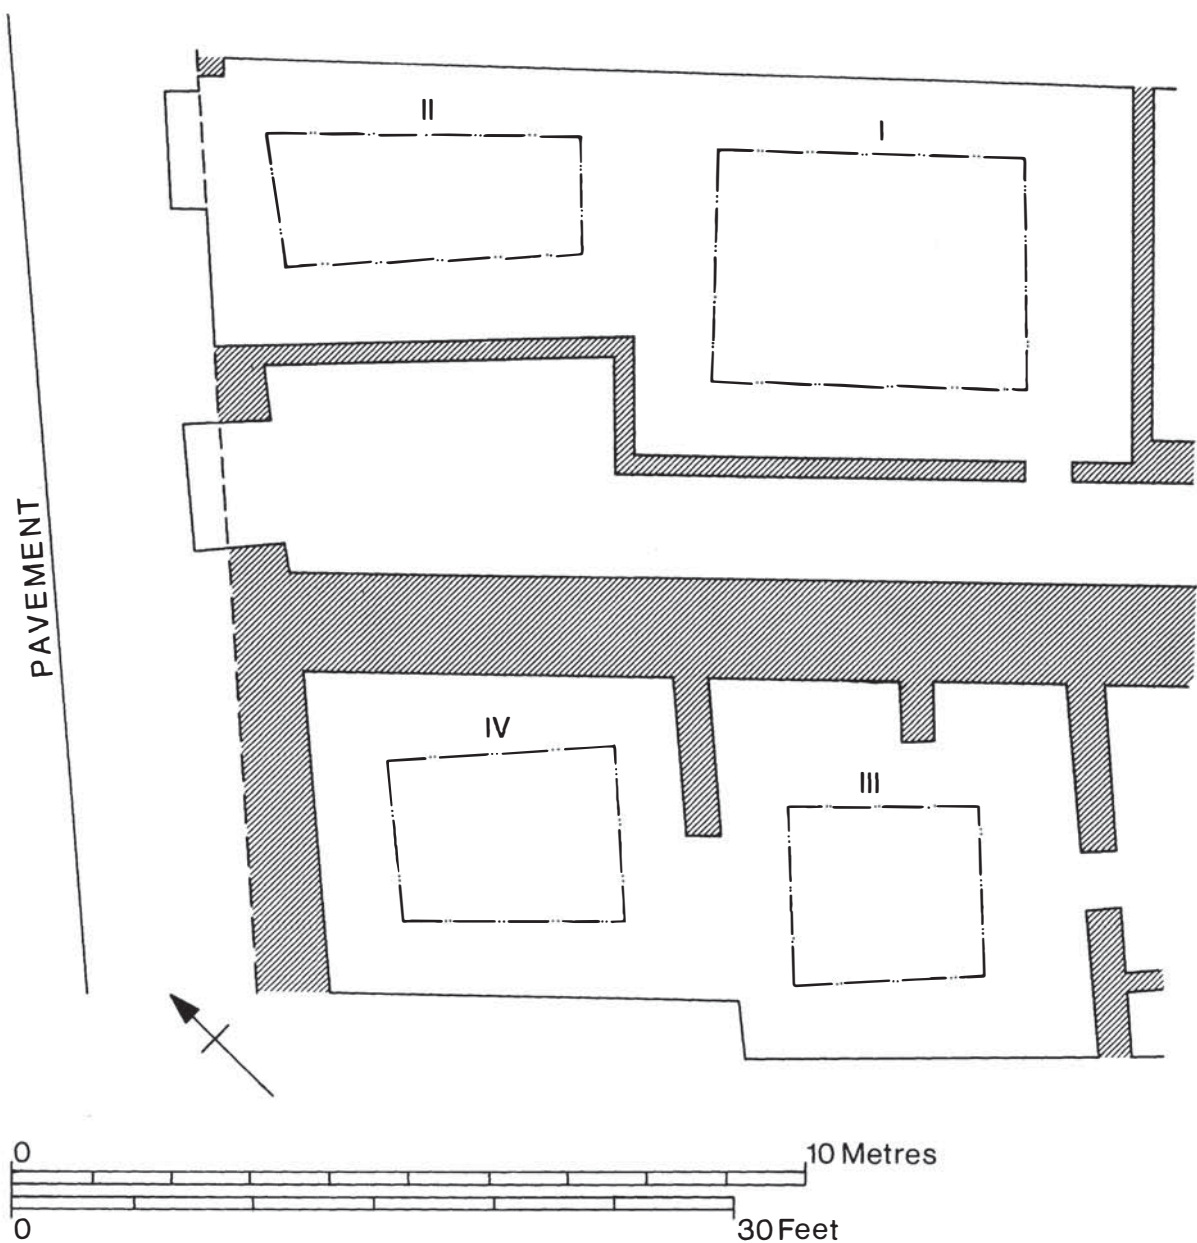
Plan of the site at Lloyds Bank, 6-8 Pavement, showing the four trenches excavated. Scale 1:120
